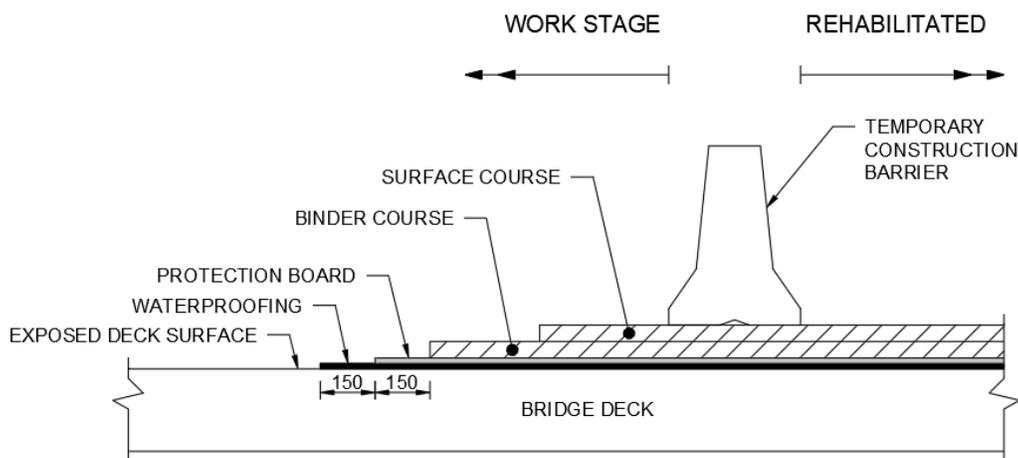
Typical waterproofing longitudinal joint detail for staged construction.
